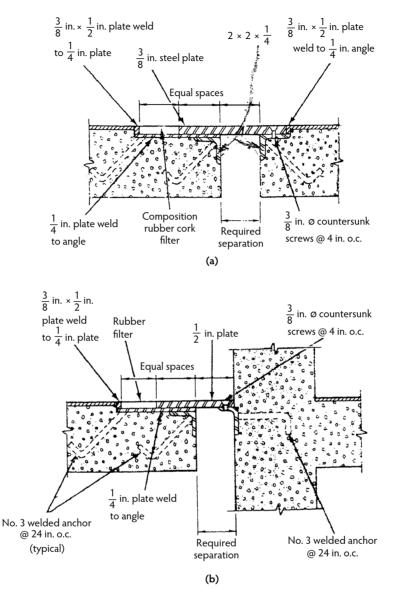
Seismic separation joints in concrete structures: (a) isolated floor plate closure, (b) building separation floor plate closure at the structure wall. (Adapted from Fintel, M., Ed., *Handbook of Concrete Engineering*, Van Nostrand Reinhold, New York, 1974, pp. 94–110.)
